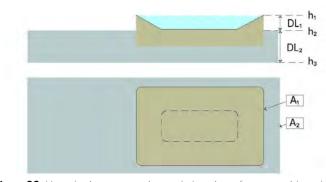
Hypothetic cross-section and plan view of system with multiple drainage layers with ponding (blue), soil (brown), and gravel (gray).
